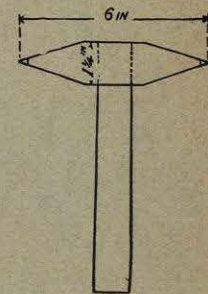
Pick for Facing Concrete. (See p. 289.)
